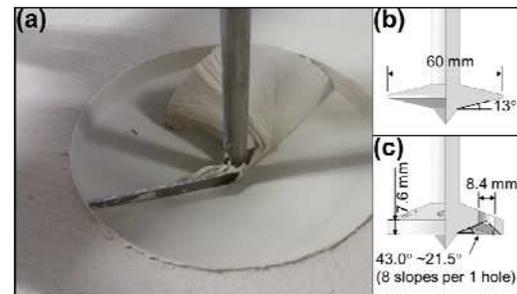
Footprint and model footings: (a) cutting tool and artificial footprint; (b) conventional footing, spudcan A; (c) novel footing, spudcan H.
